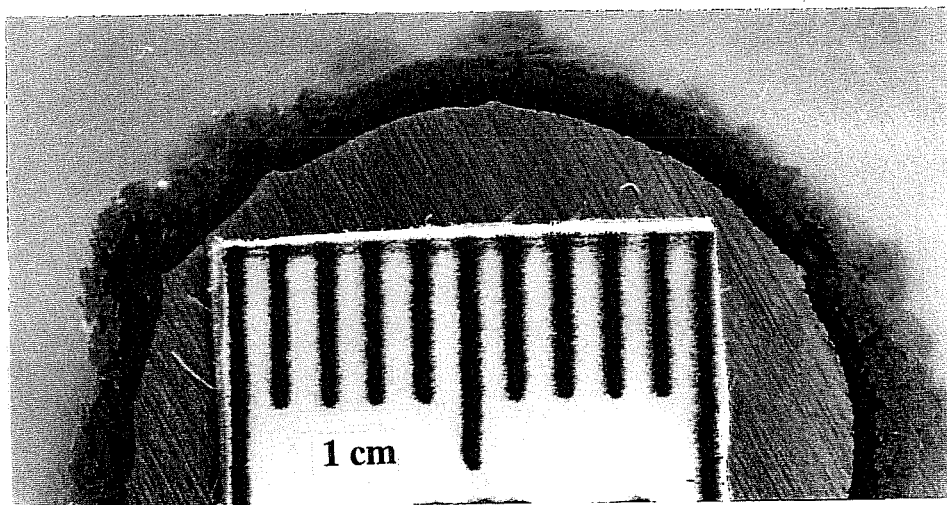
Close-up picture of the cross-section of a corroded reinforcing steel bar, showing three layers of corrosion products.
